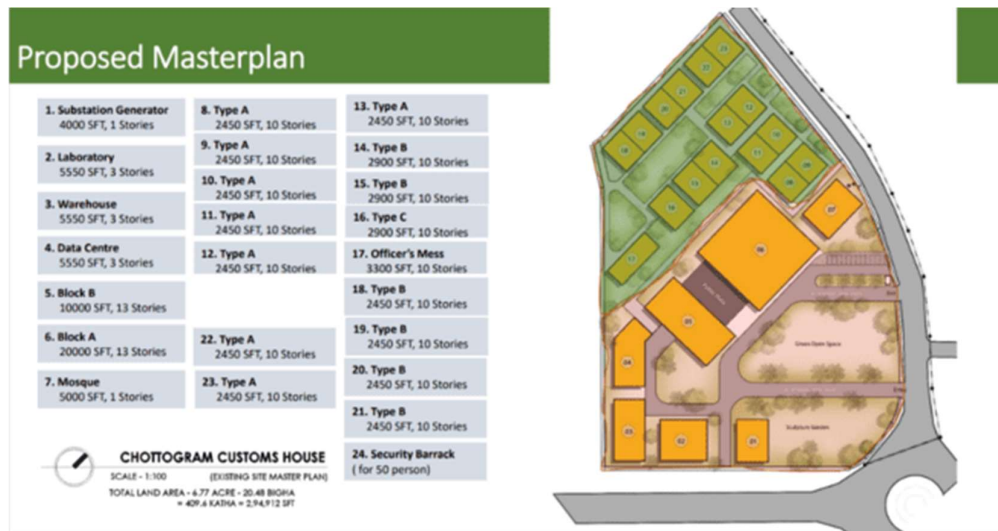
Proposed Master Plan, Chattogram Customs House
